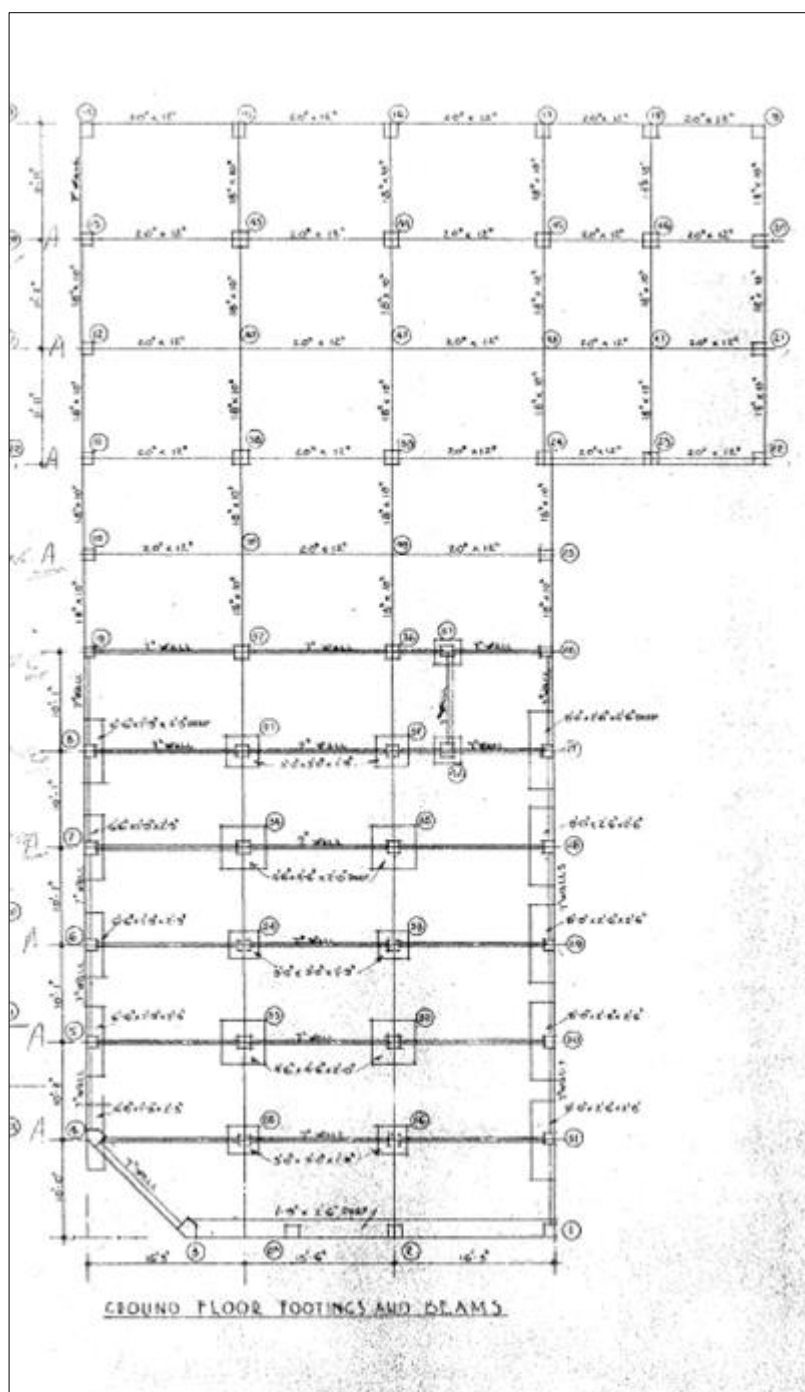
Bradley's Building Ground Floor Footings and beams, March 1946. Source: WC Archives 00056:320:B25050
